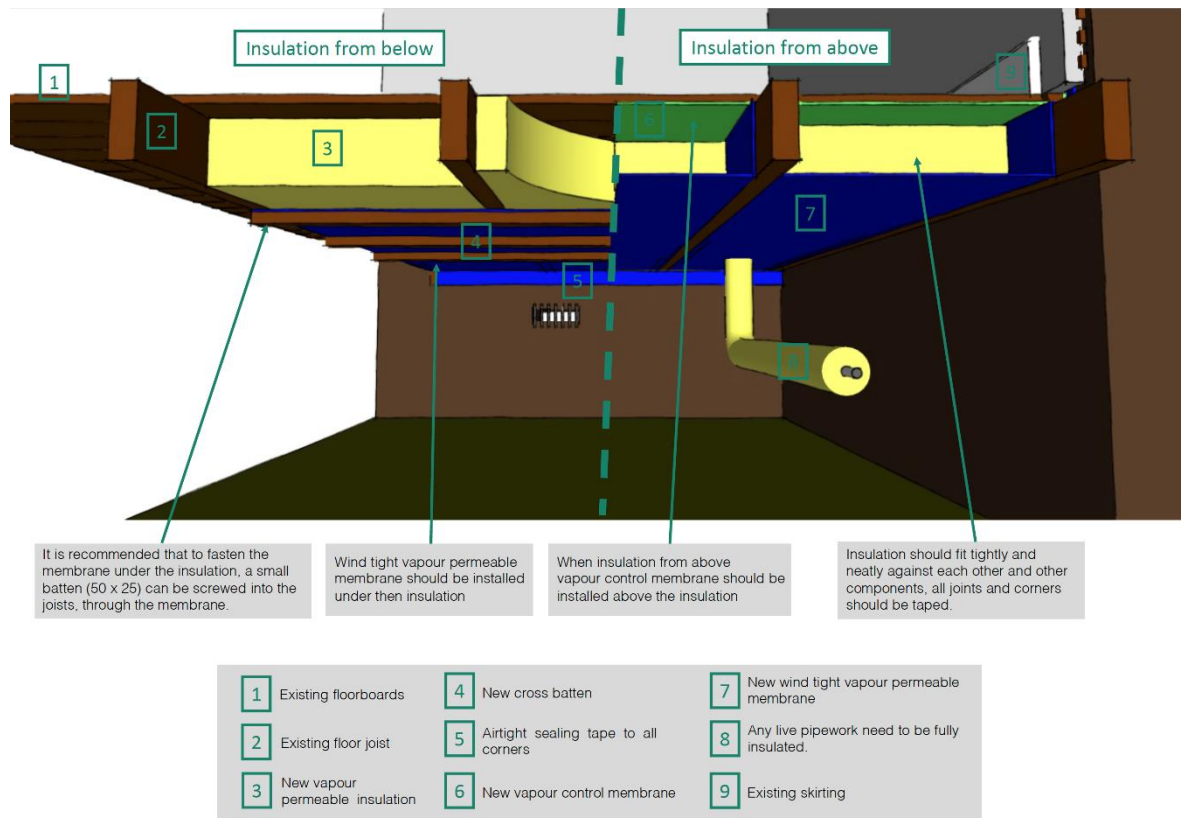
Typical suspended timber floor insulation. At the right, works from below, and ate the left works from below.
